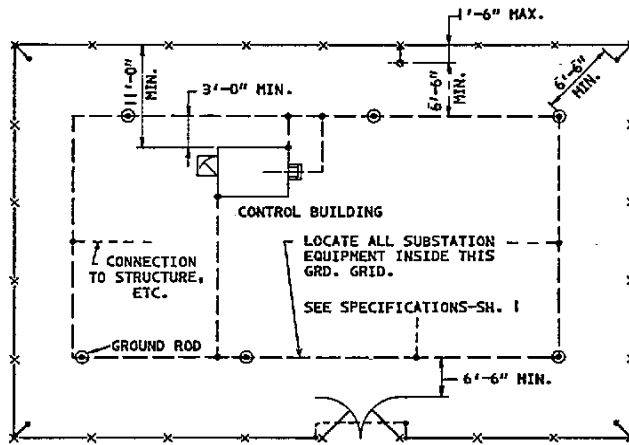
TYPICAL ARRANGEMENT OF GROUND OUTDOORS
